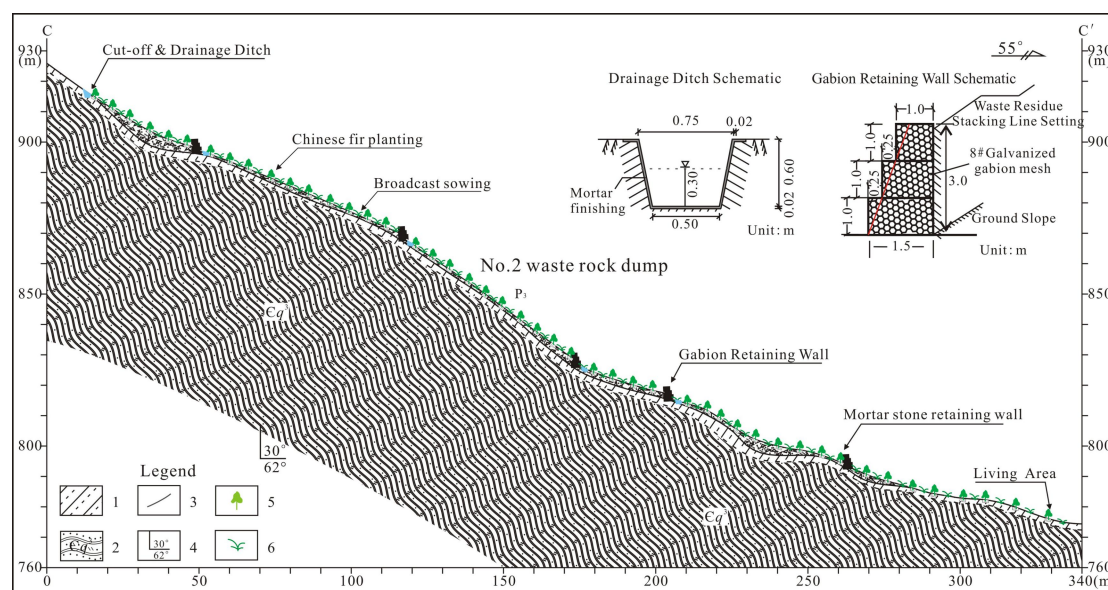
Cross-section Profile of Waste Rock Dump Treatment Engineering
